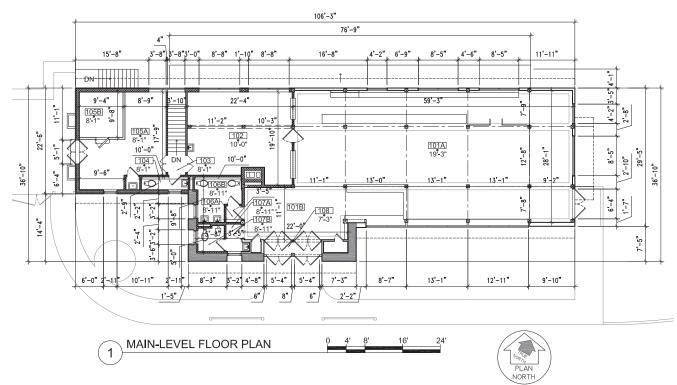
Main-floor plan. A larger version of this plan can be found in Appendix B.
